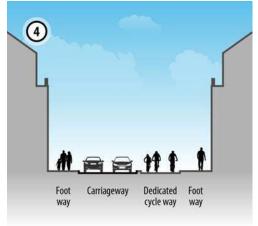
Indicative Street Section 4: Primary Street, Ashton Centre.
